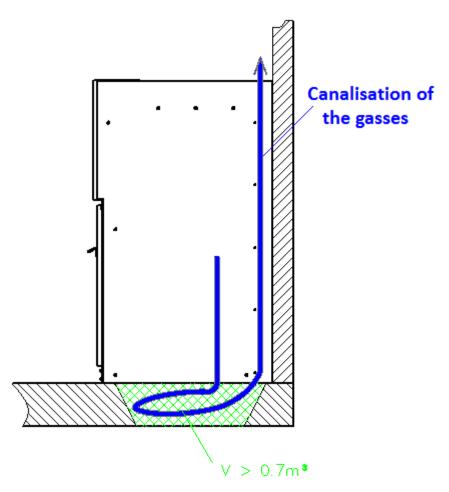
Gas escape route when placing the switchgear with a cable cellar available (Lateral view of installation)
